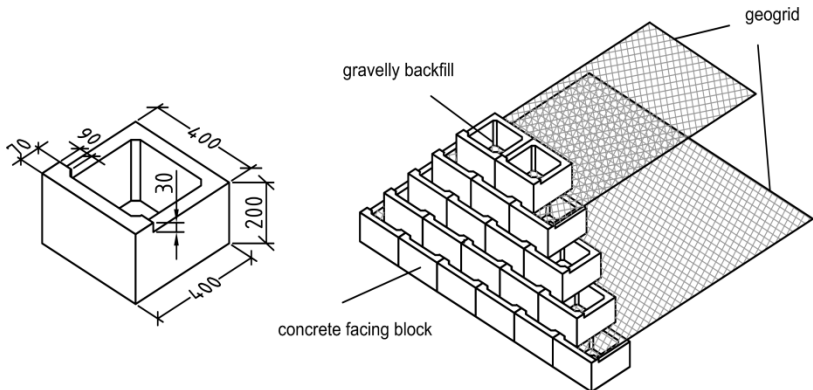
Wall from small prefabricated blocks with a detail of typical block
